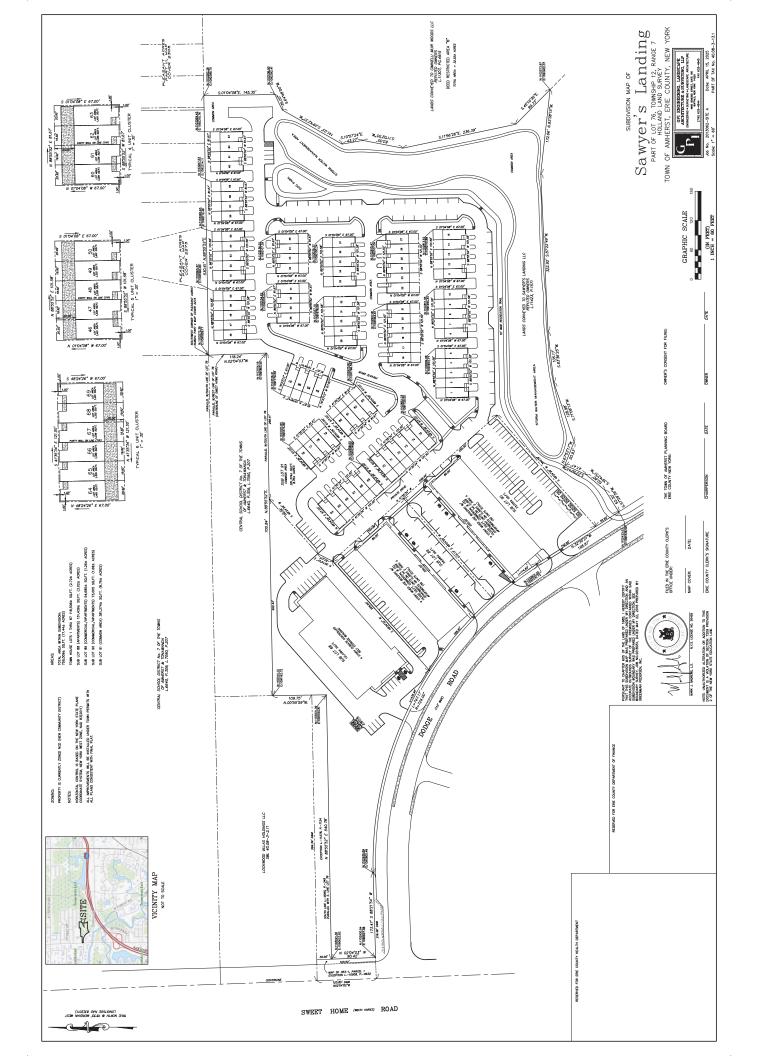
Site Plan Amendment Resolution Adopted by the Planning Board on March 20, 2025
